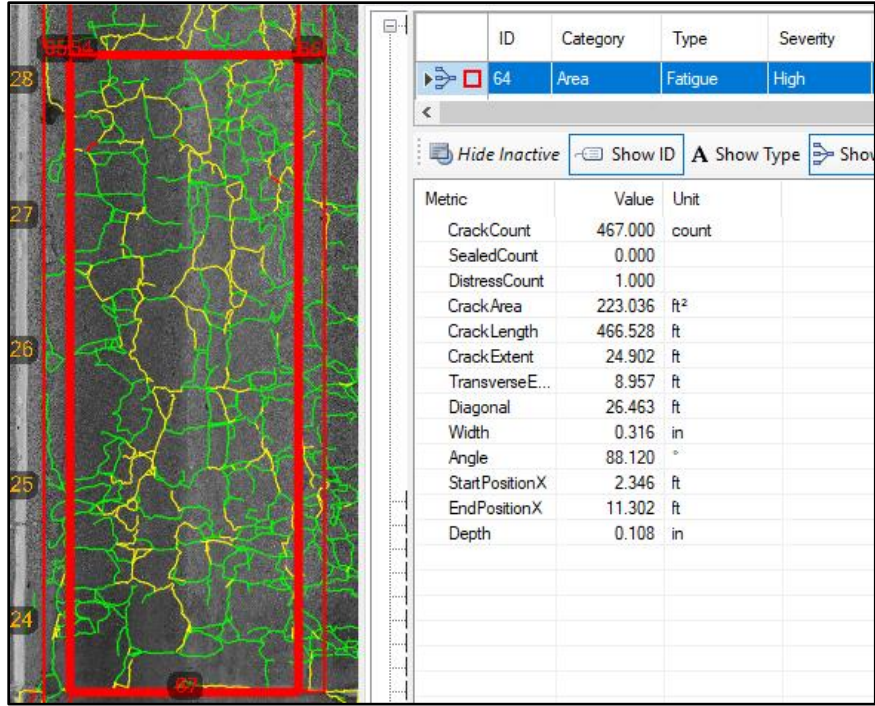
High Severity Fatigue Crack Area Inside the Red Rectangle
